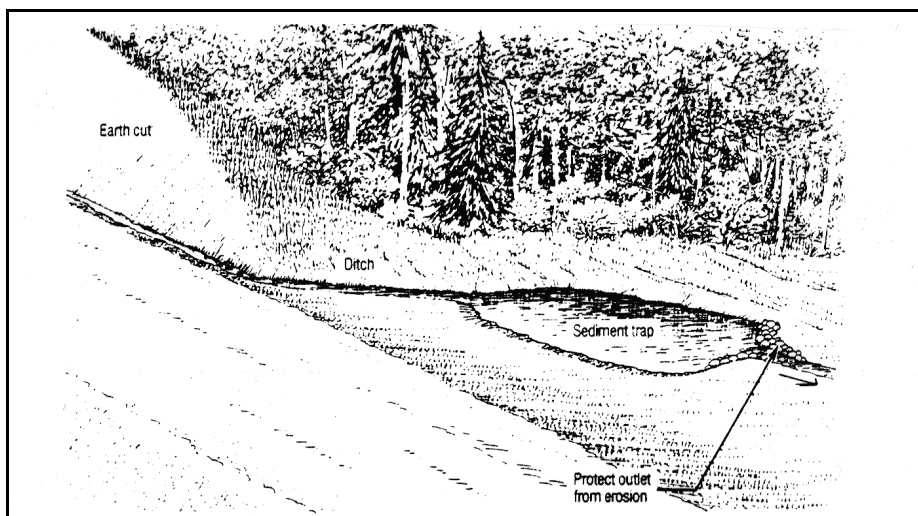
Sediment trap constructed to collect runoff from ditch along cutslope (Ontario MNR, 1990).
